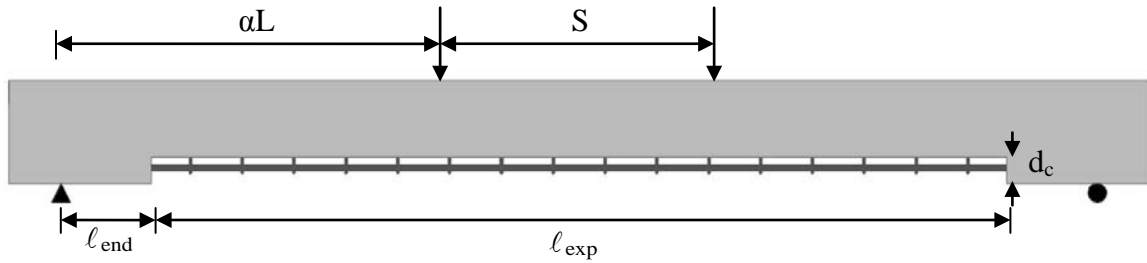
Elevation of Specimen with Exposed Flexural Reinforcement with Important Parameter Identified.
